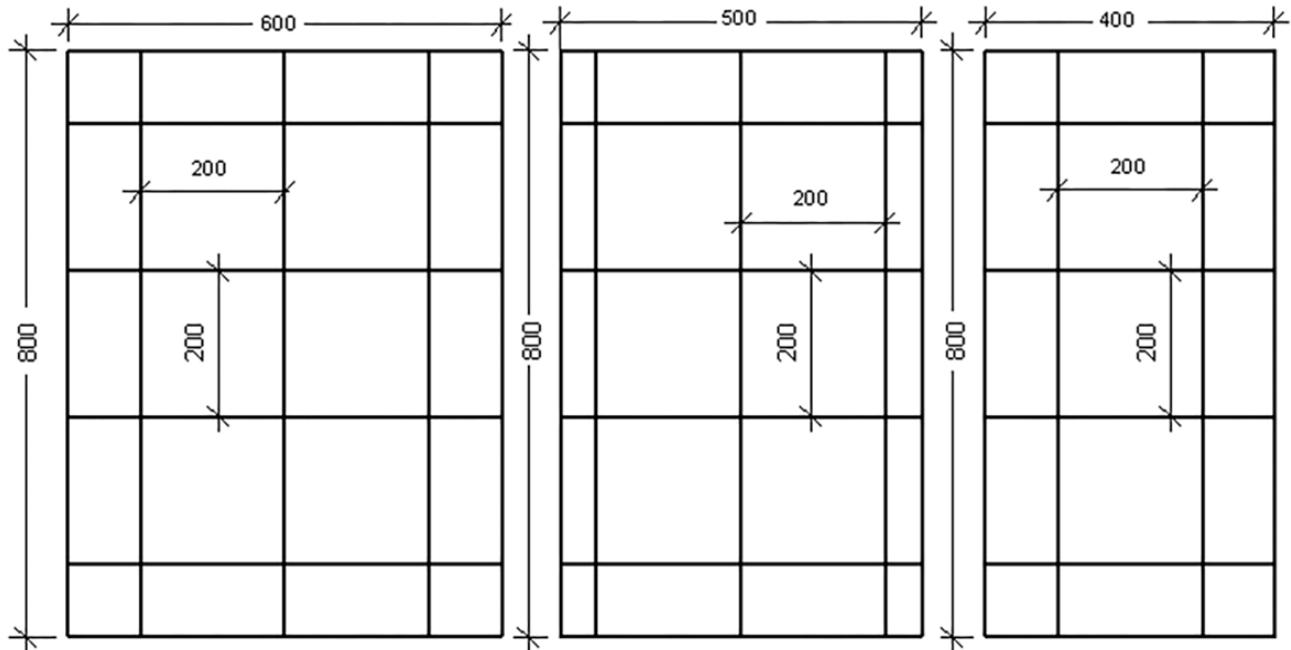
Details of reinforcements and dimensions of slabs in (mm)
